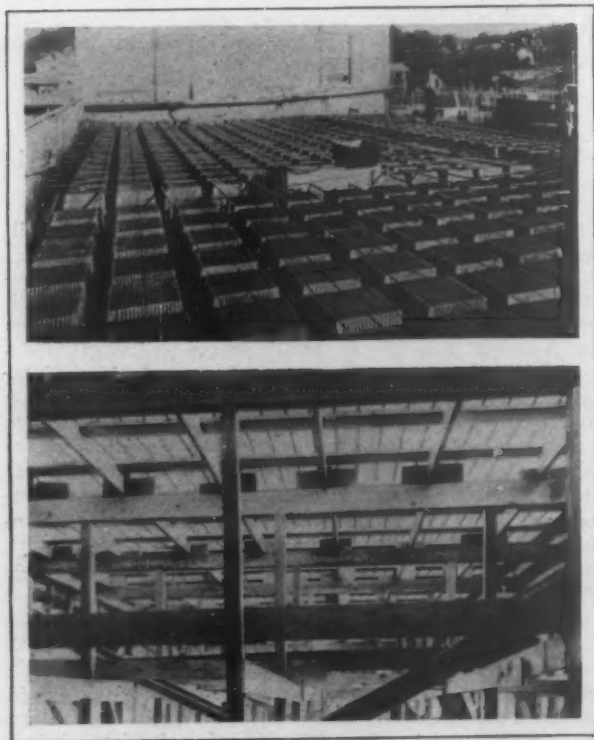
Views Taken Above and Below a Floredome Floor During Its Construction
